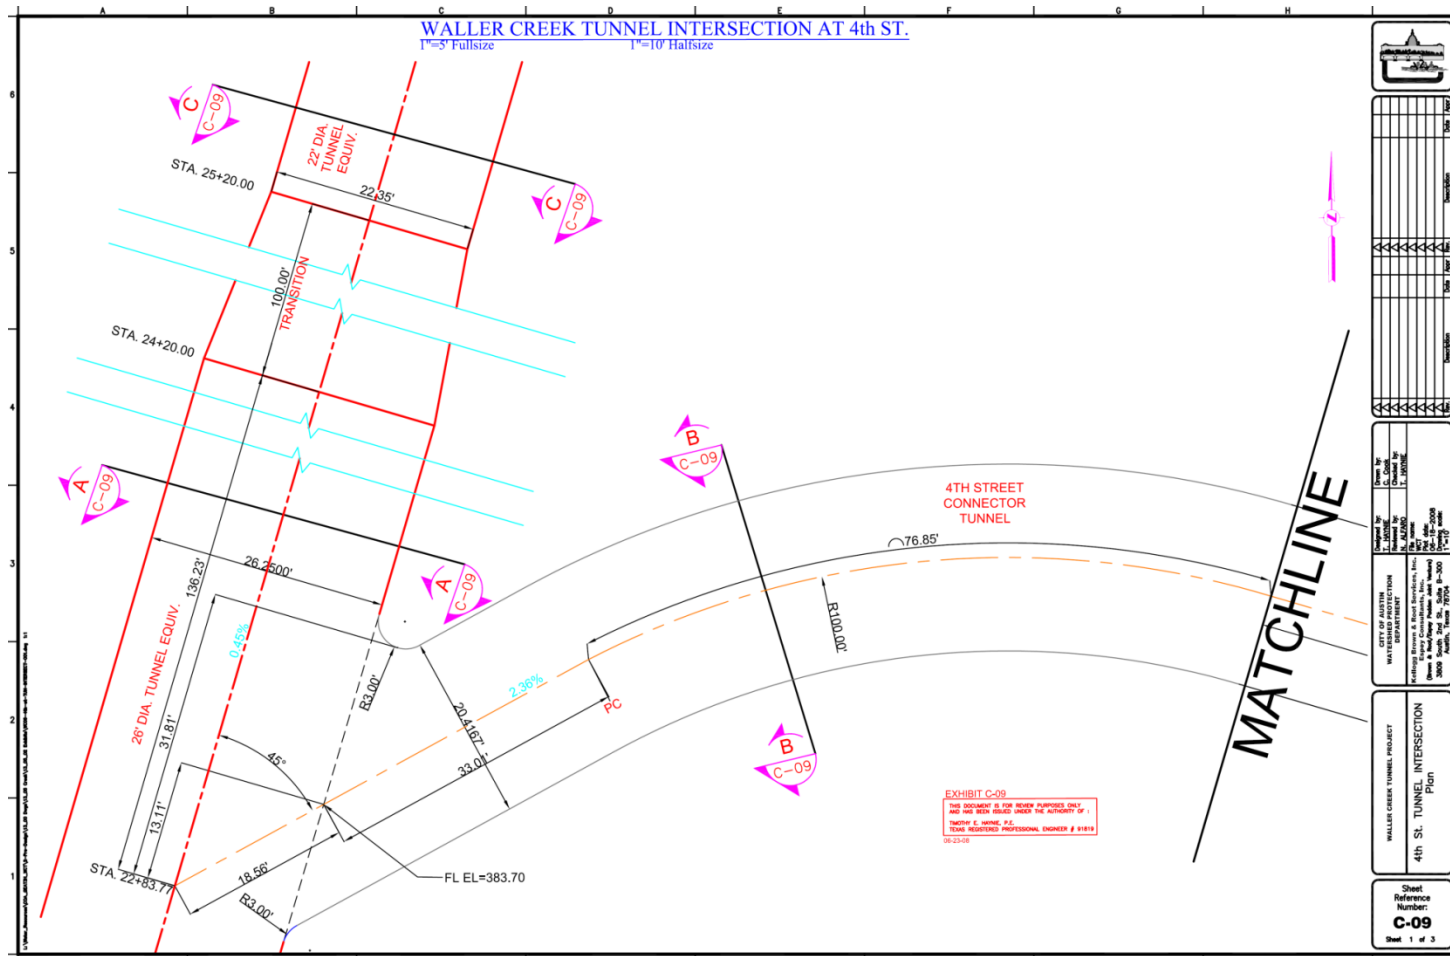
Waller Creek Tunnel Project; Tunnel Intersection at 4th Street-Plan
